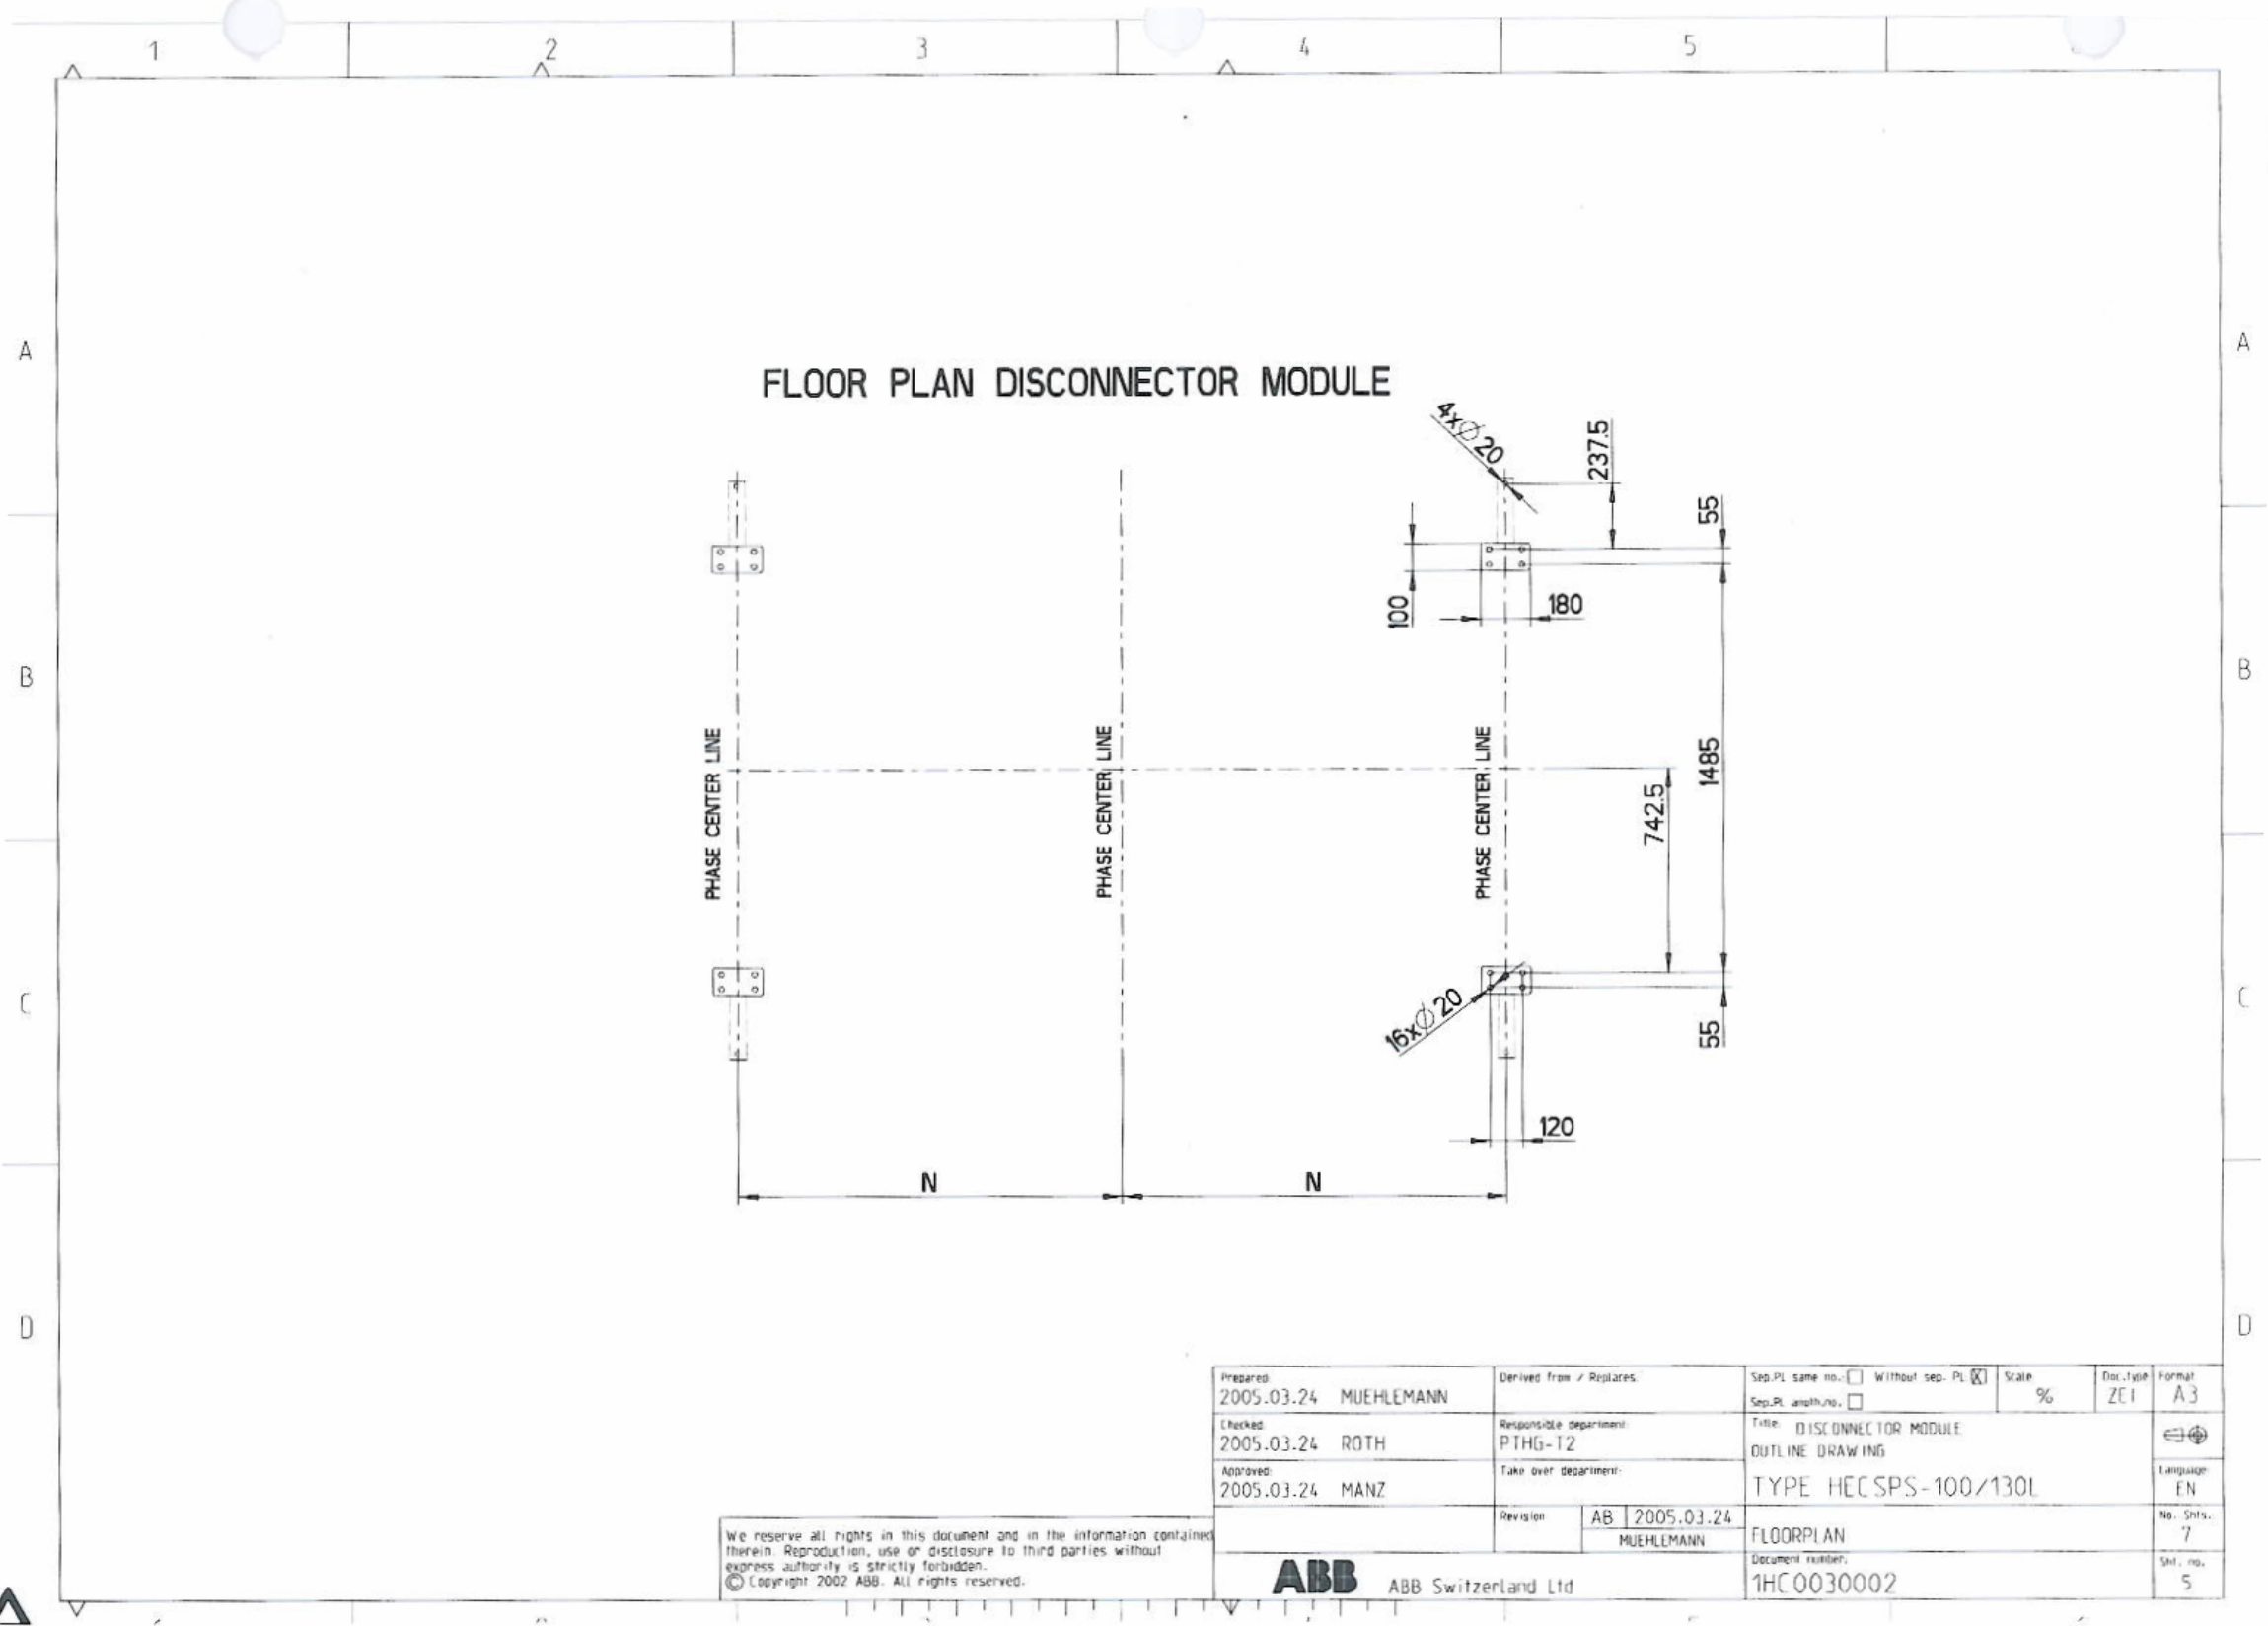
Toshiba Typical Supply ABB Type HECPS-100/130L, Drawing 1HC0030002, Sheet 5 of 7
